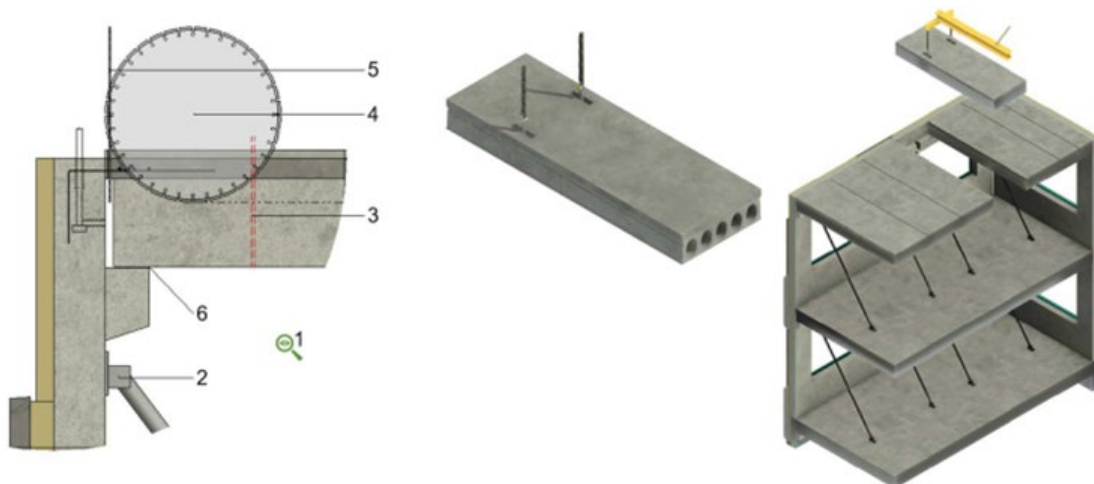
Overview of the deconstruction of the hollow core slabs from the Structural Deconstruction Plan of Prinsenhof by Lagemaat.
